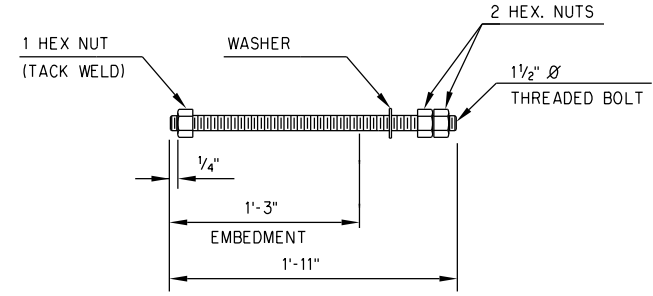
DETAILS OF BEARING ASSEMBLY AT ABUTMENTS
